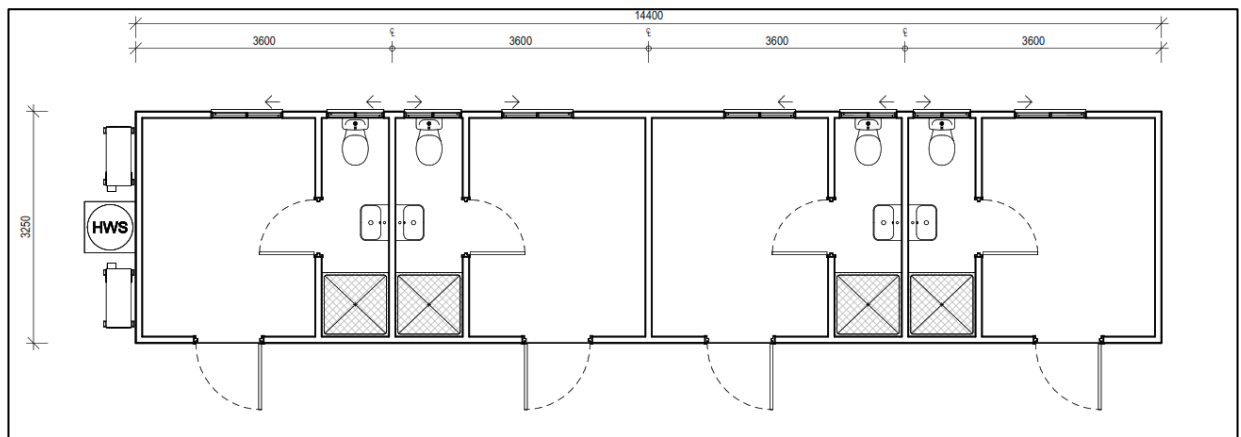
Accommodation Module Floor Plans (Source: The Design House NQ, 2026)
